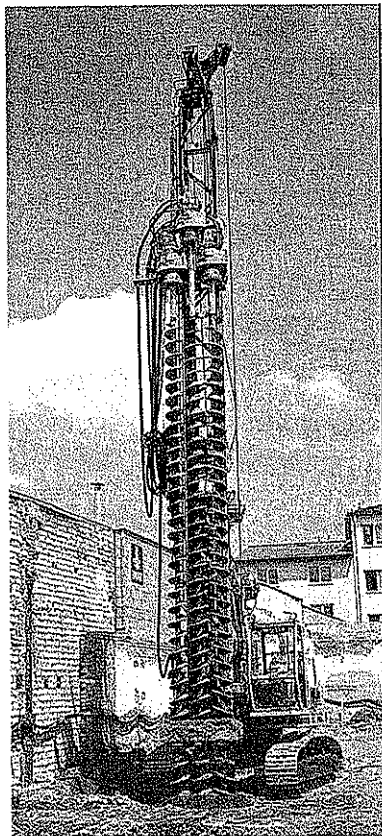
Triple auger for construction of slot diaphragms (courtesy of Bauer).
